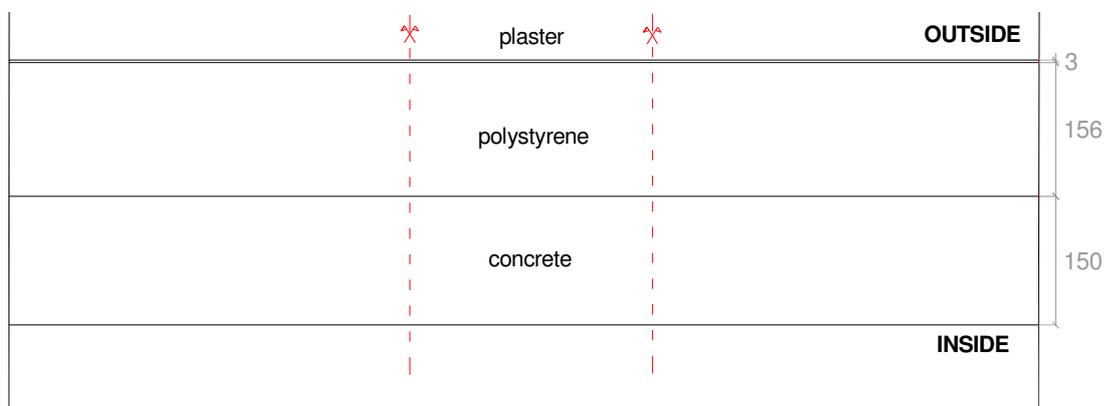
Symmetry of concrete based wall model, units in mm.
